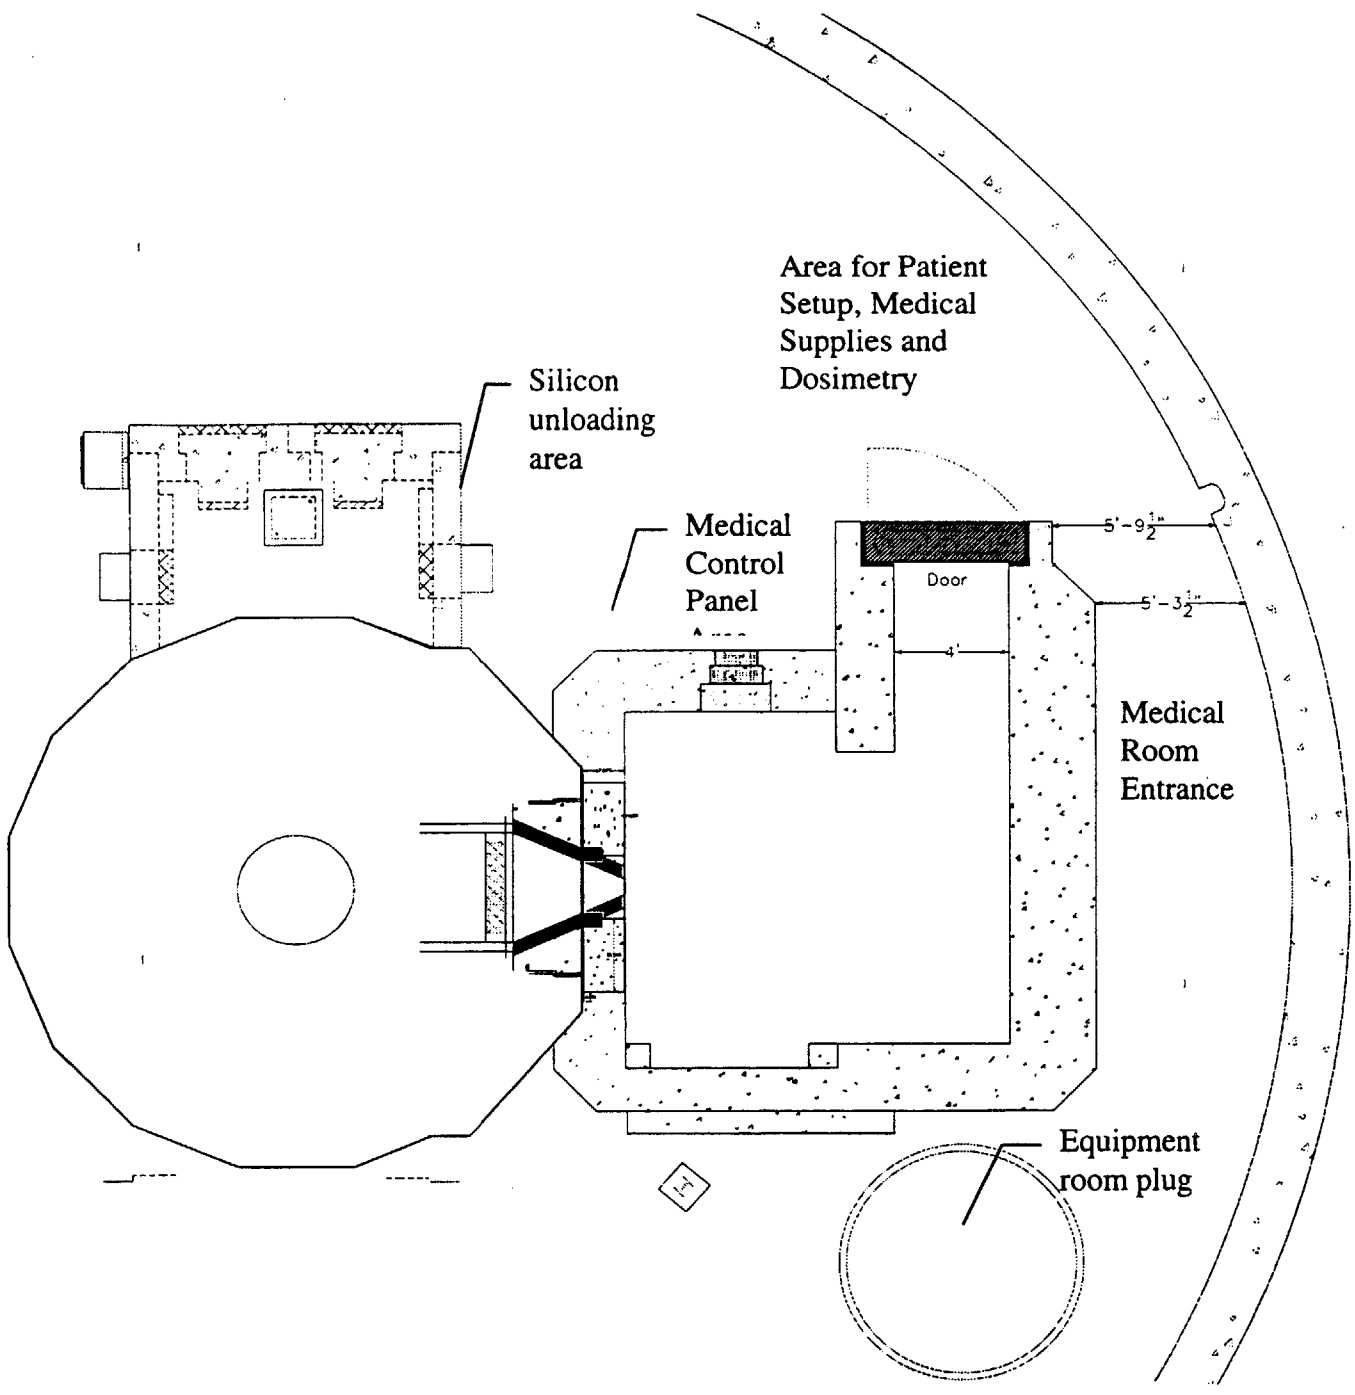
Plan View of the New Medical Room Layout. (Courtesy of M.N. Ledesma)
